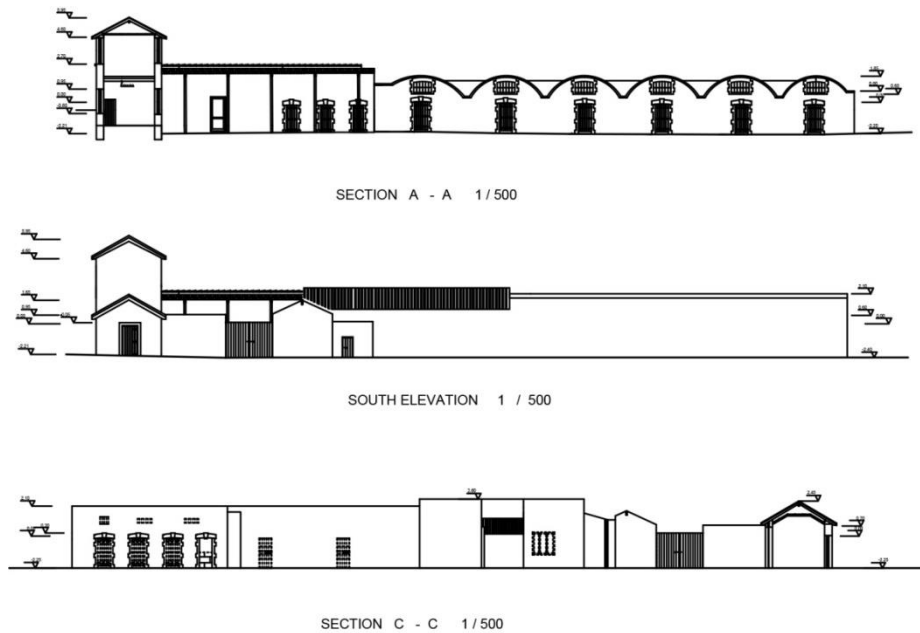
The section and elevation of the Old police Station; (Department of Antiquities and Museums, 2018)
